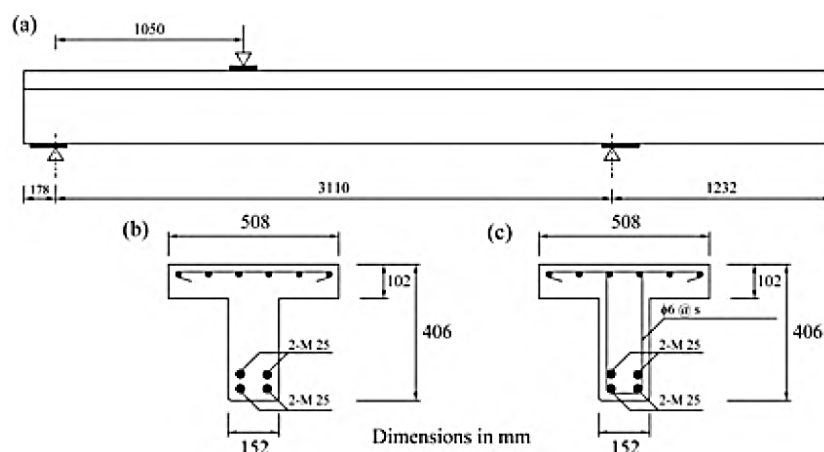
Details of concrete beams: (a) elevation, (b) cross section with no transverse steel and (c) cross section with transverse steel (Chaalal et al., 2011).
